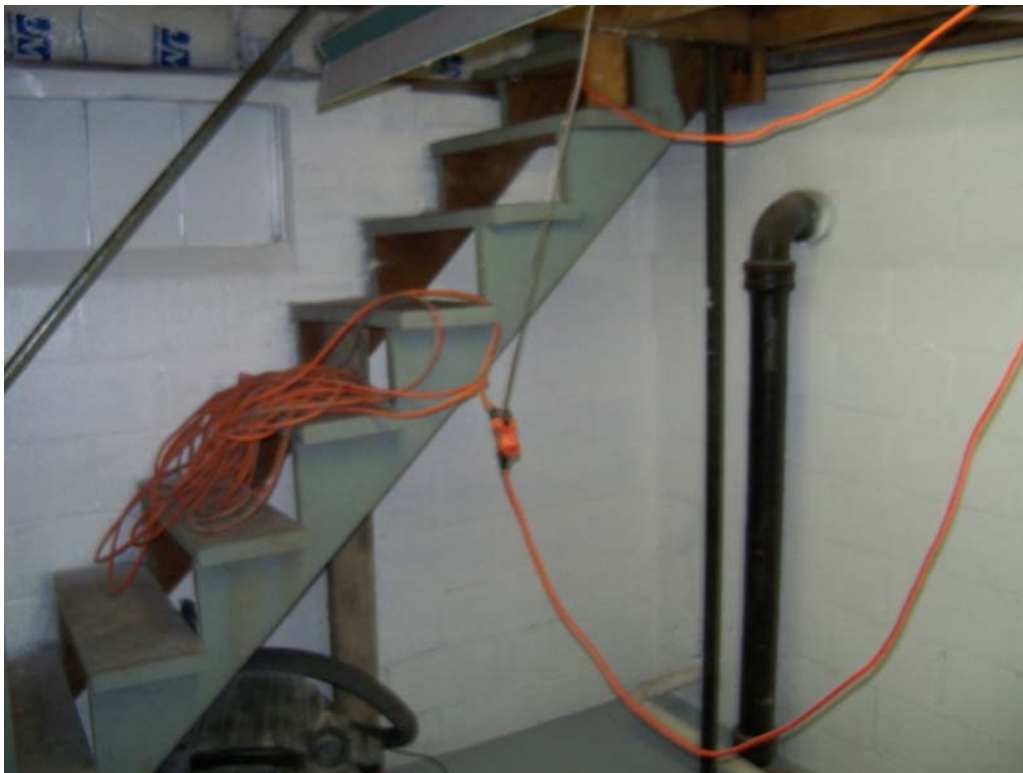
Southeast corner of northwest basement room, looking southeast, showing wall and floor sealant, interior stairway, and sealed utility penetration
